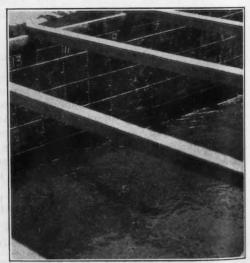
Wall of 5-Foot Parshall Flume, Showing Arrangement of Metal Strips Used in Plotting Water Surface Curves
